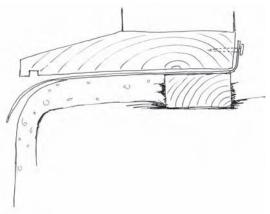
Sill flashing fixed to facilitate water discharge onto the external face of the rendered wall below the window
